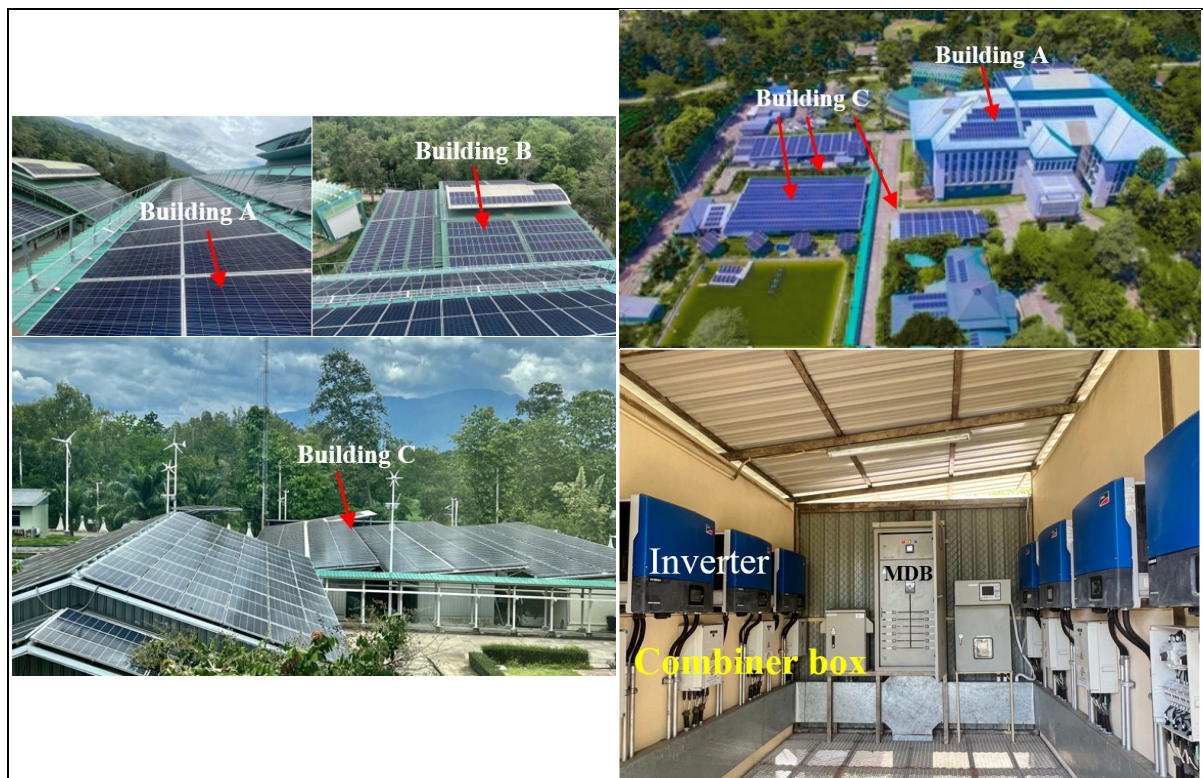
The installation of solar panels on Building A, Building B, and Building C and Powerhouse.
